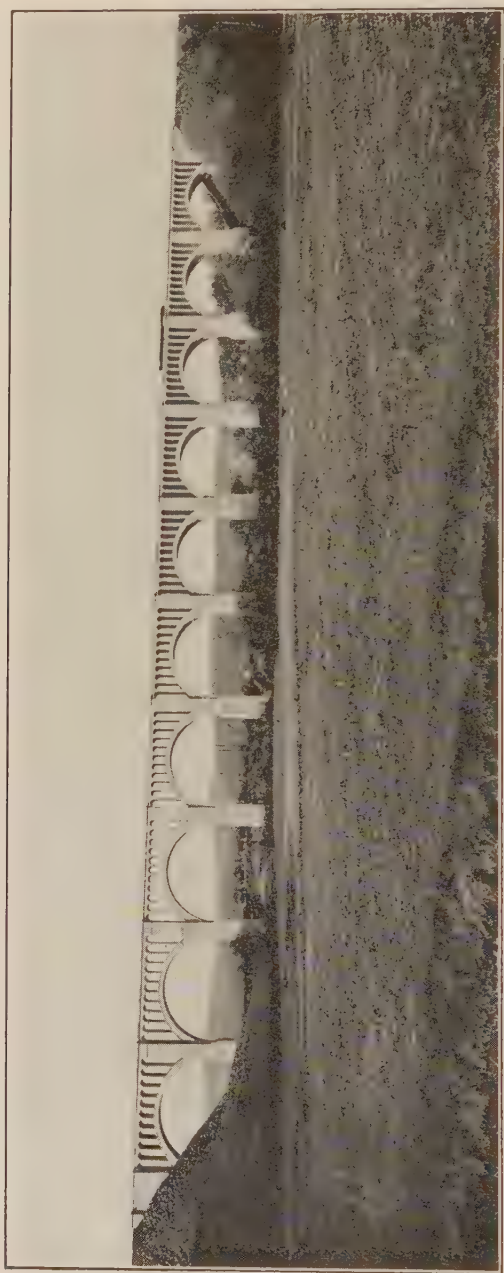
TUNKHANNOCK VIADUCT, LACKAWANNA RAILROAD.
